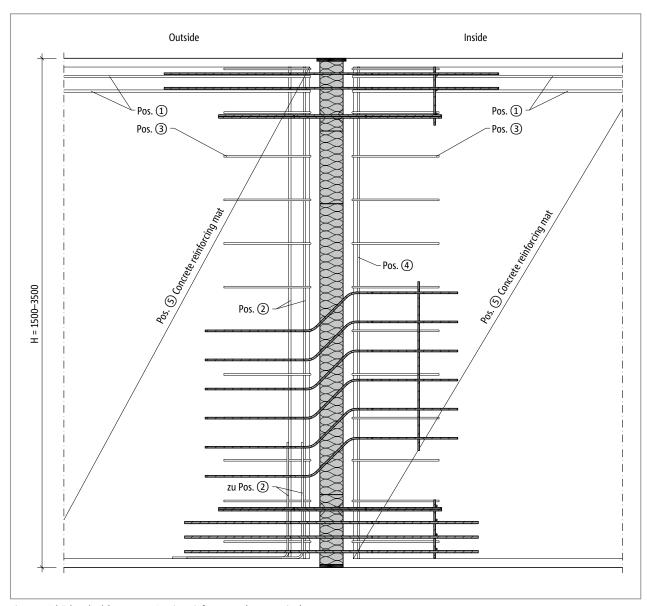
Schöck Isokorb® T type W: On-site reinforcement (cross-section)
